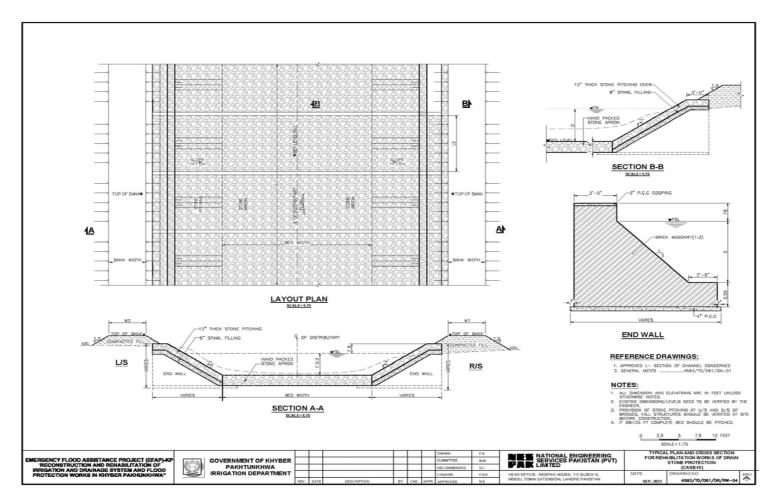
Typical Cross Section for Rehabilitation of Drains Stone Protection
